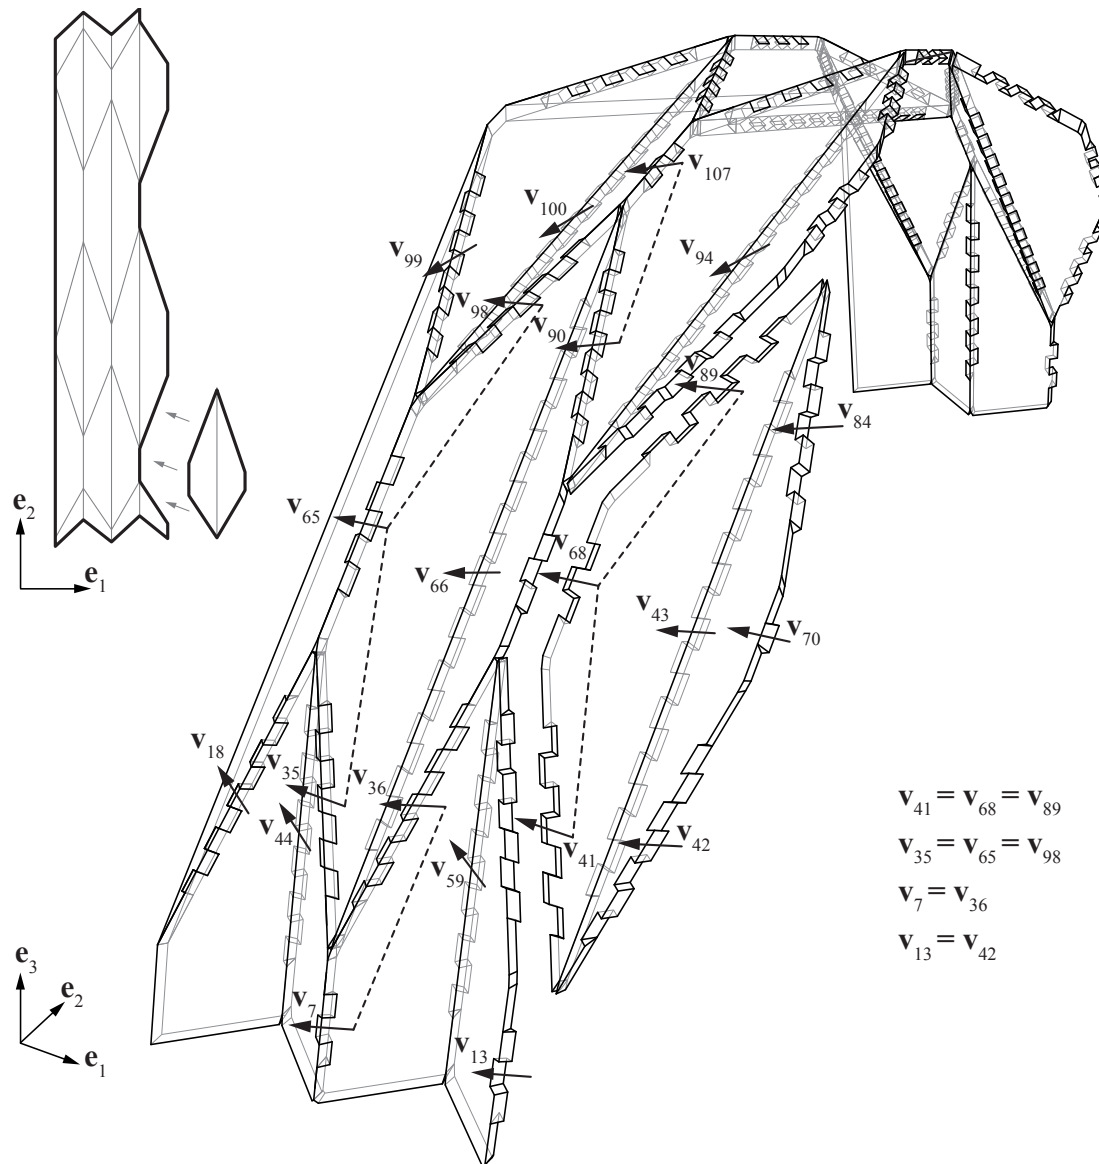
Left-to-right-side assembly of the Interlocking folded plate shell prototype. Built from Kerto-Q structural grade LVL panels (7-layer, I-III-I)
